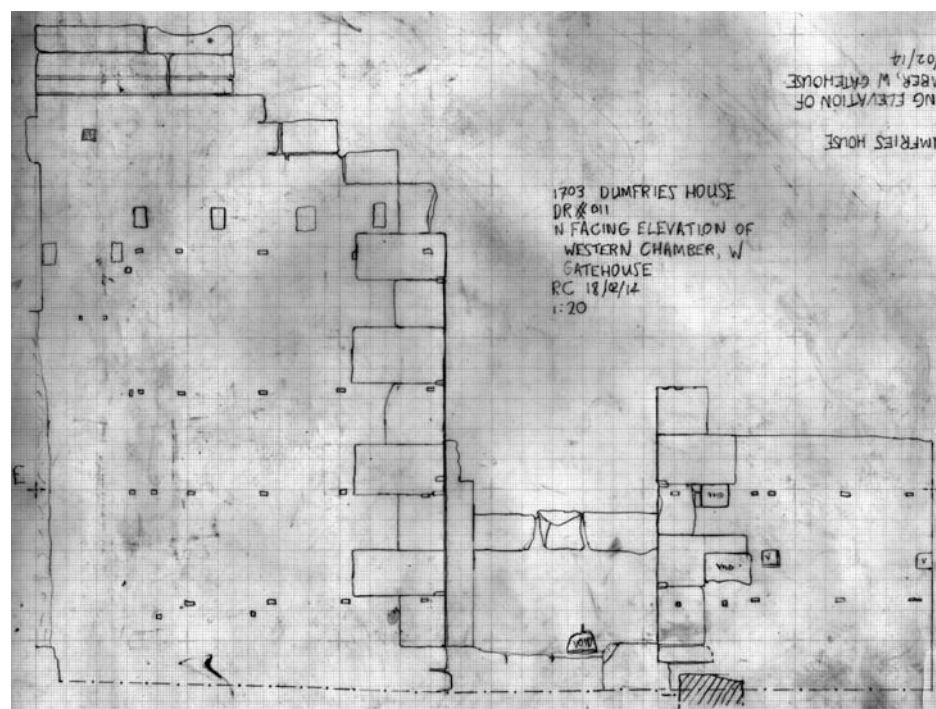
N facing internal elevation of Western Chamber - Drawing No.011
